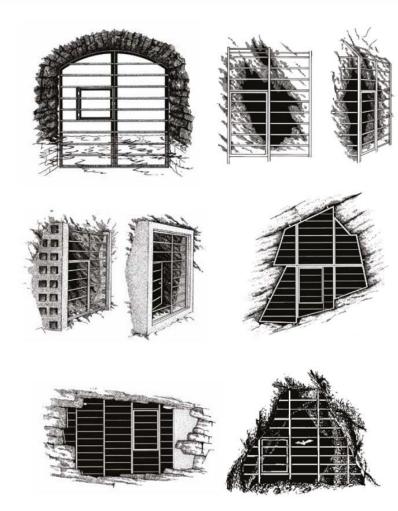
Examples of grilles fitted to horizontal entrances. Grilles can be made oversized and pinned to the rock face, fitted inside the entrance using bolts or pins or built into blockwork to square up and stabilise the entrance. Large grilles can be constructed off-site in sections and bolted or welded on site. A lockable entrance door should always be fitted.
